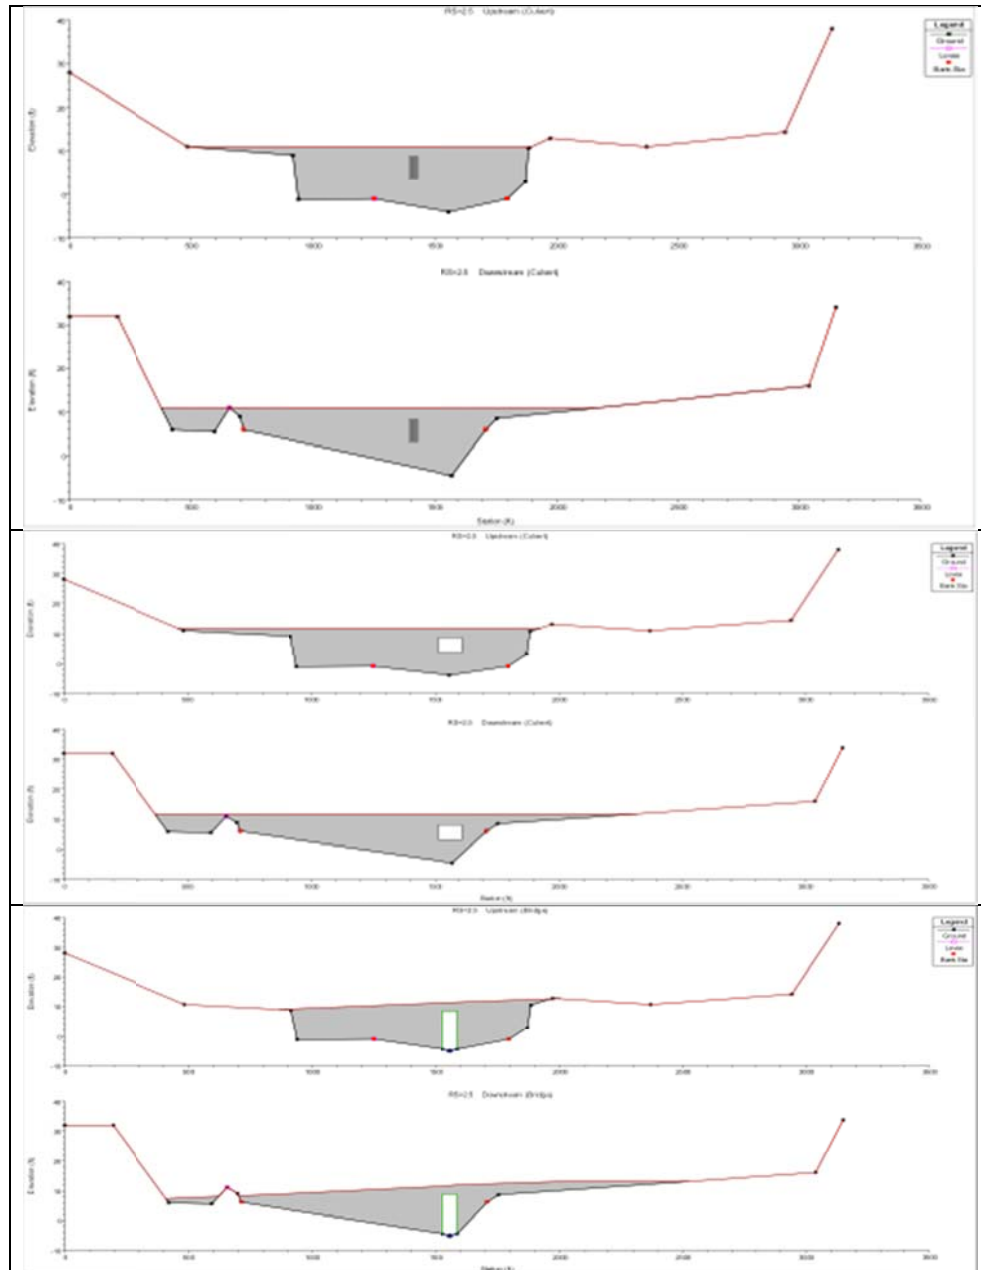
Upstream (top) and downstream (bottom) bridge representations for a) existing 4-opening bridge; b) box culvert and c) span.
